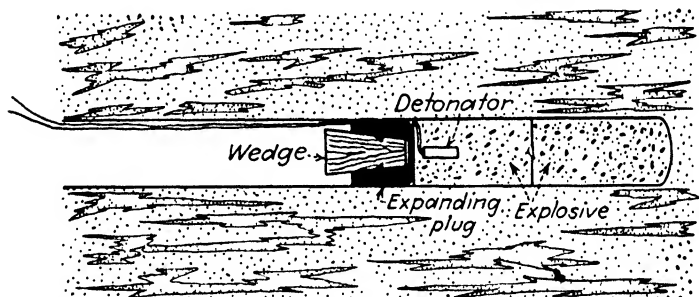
Heitzman patented rubber plug for stemming a blast hole.
